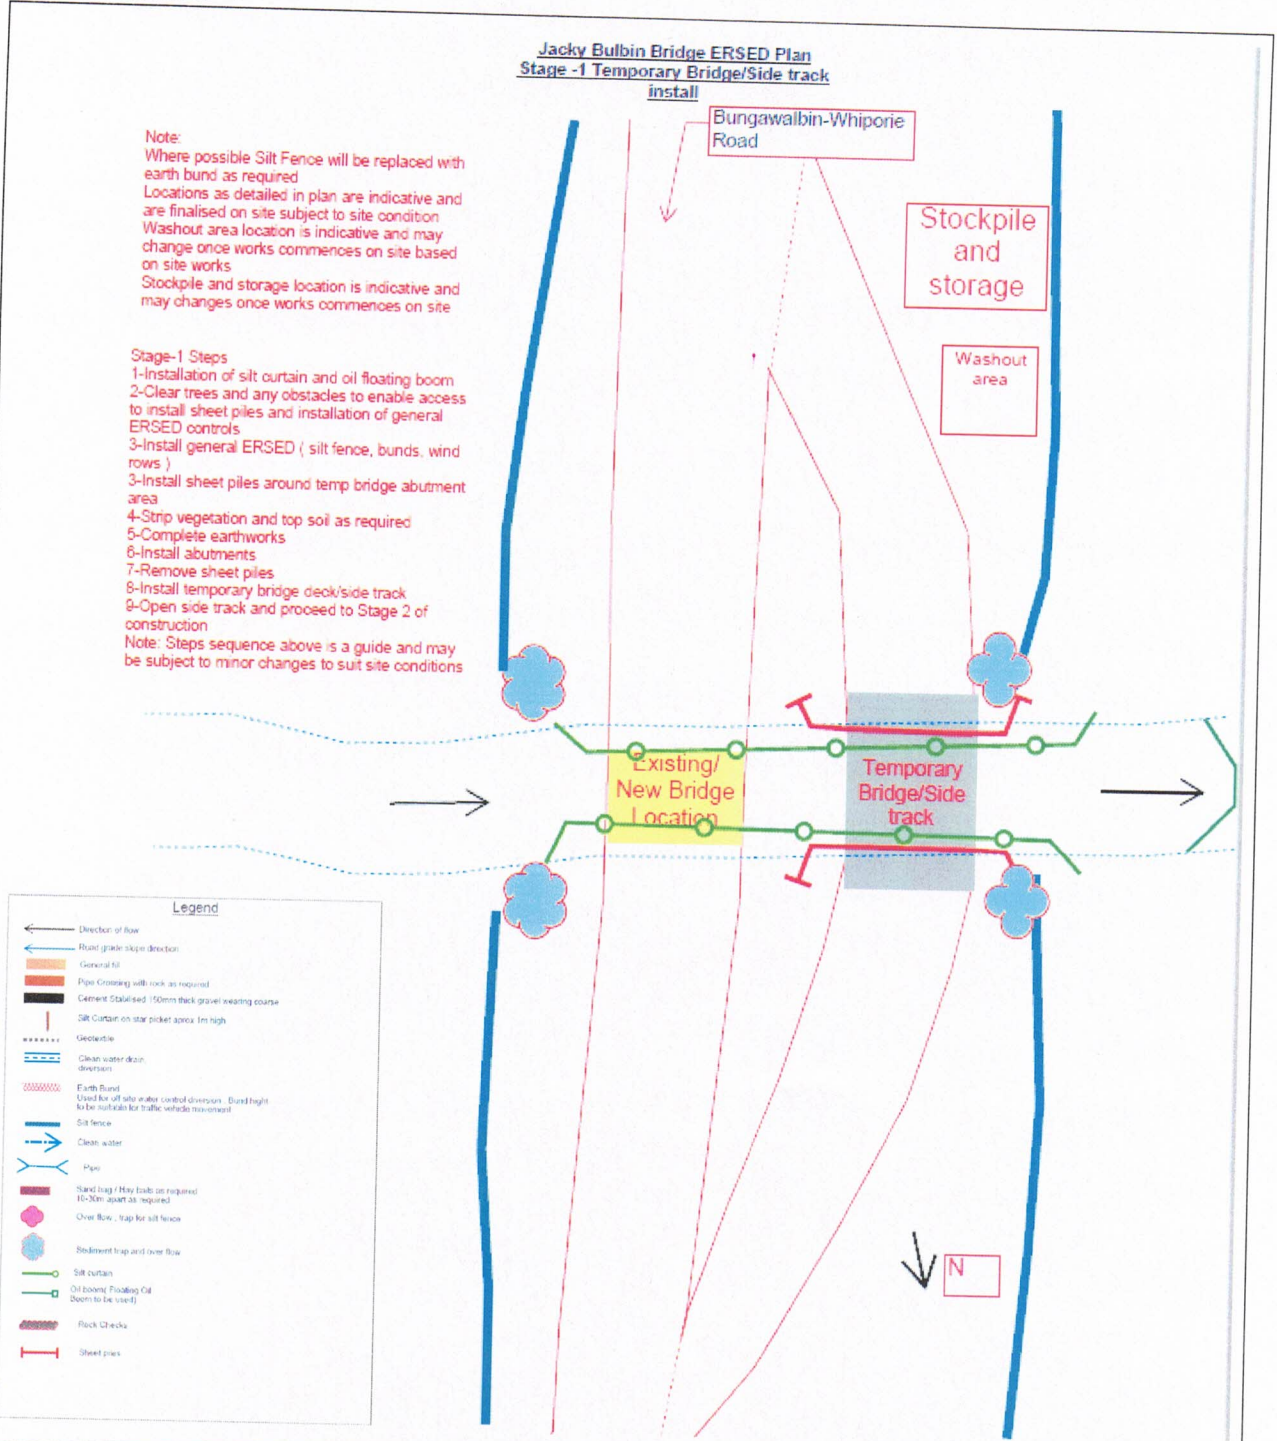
Site layout plan for Jackybulbin Bridge temporary bridge install works including minimum sediment and erosion control actions as described within the *Permit Activity* section above.
